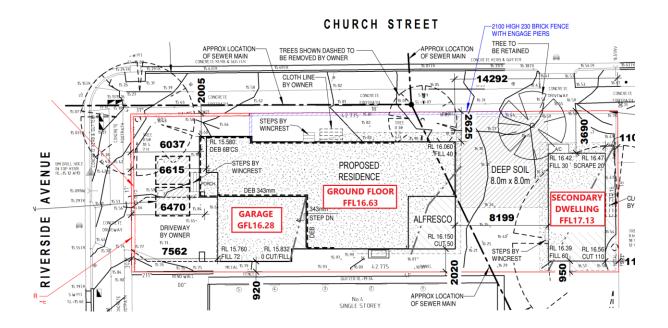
Post-Developed Site Plan/Floor Level Recommendations
